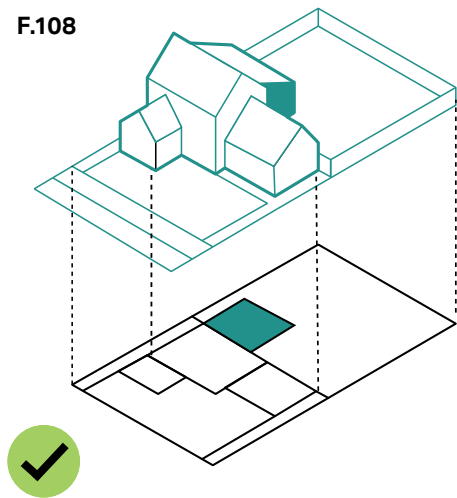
An acceptable example of a rear extension with a roof form and pitch which sits below the main ridge line of the original building.
